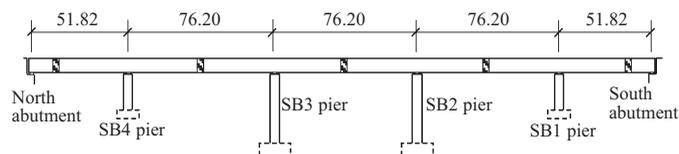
Longitudinal layout of the Kishwaukee River Bridge
